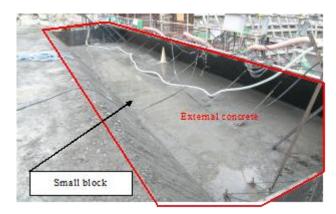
View of Placing of External Concrete using the Cruising RCD Construction Method
